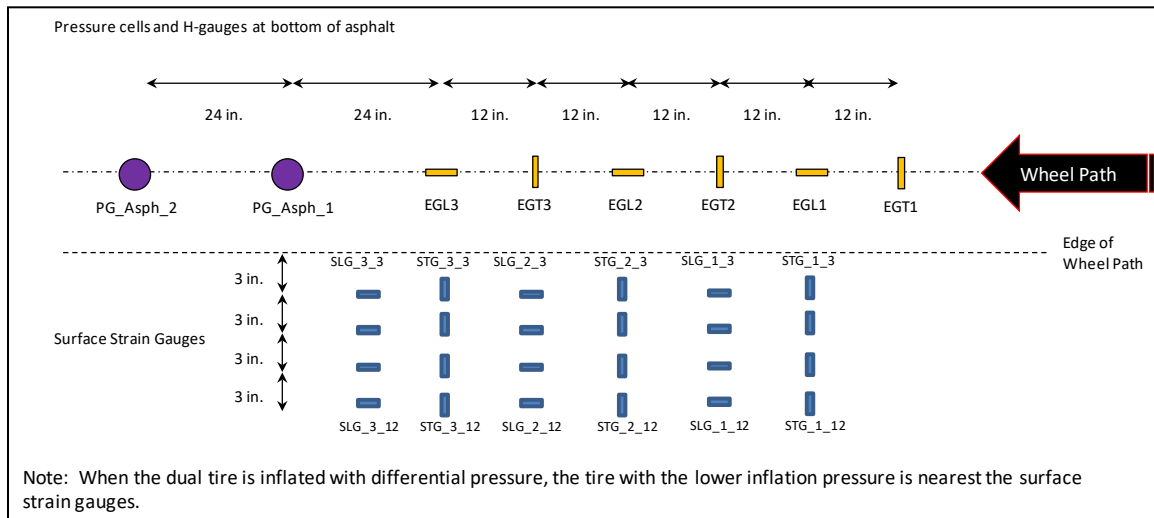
Illustration. Plan view of test pit instrumentation layout.
